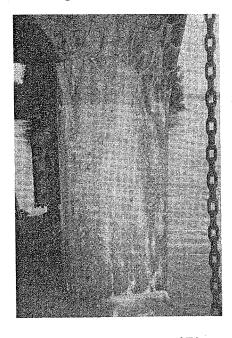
Upstream face of Pier 42 as seen during the concrete condition survey performed in 1985.
